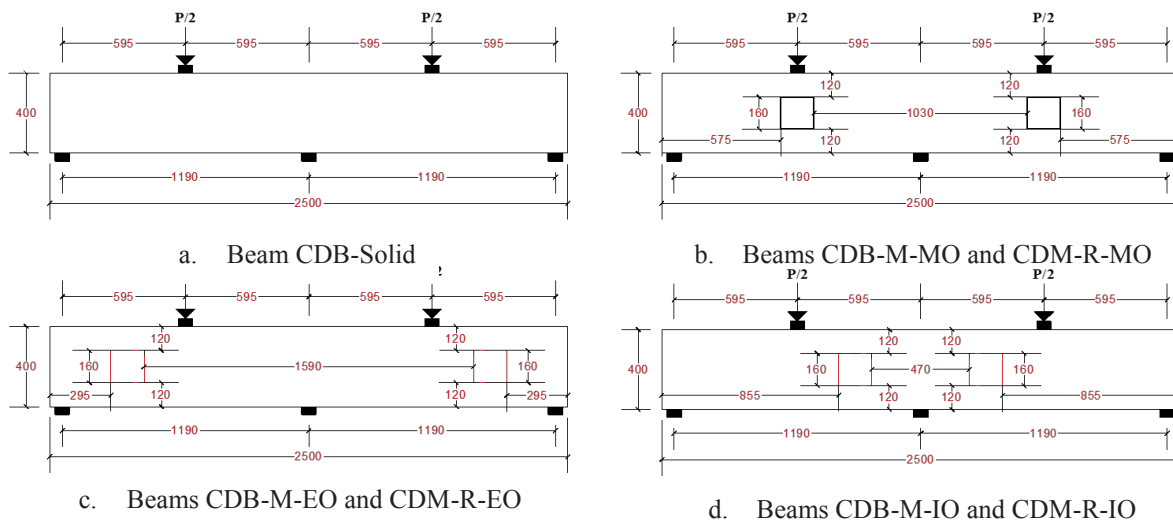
Layout of typical experimental specimens (all dimensions are in mm).
